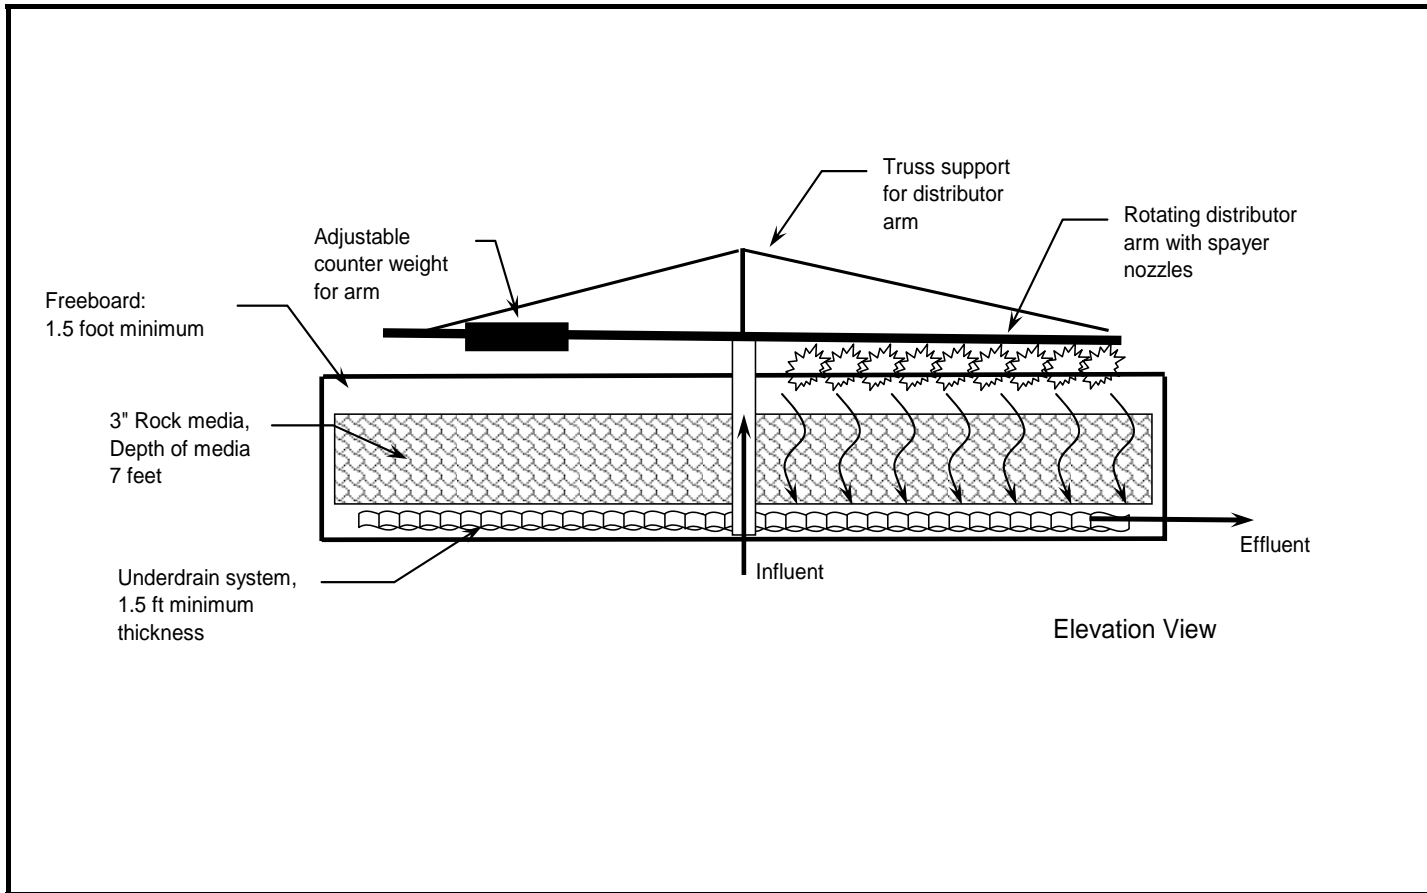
Typical Cross Section for Preliminary Design of Las Vegas Trickling Filter
